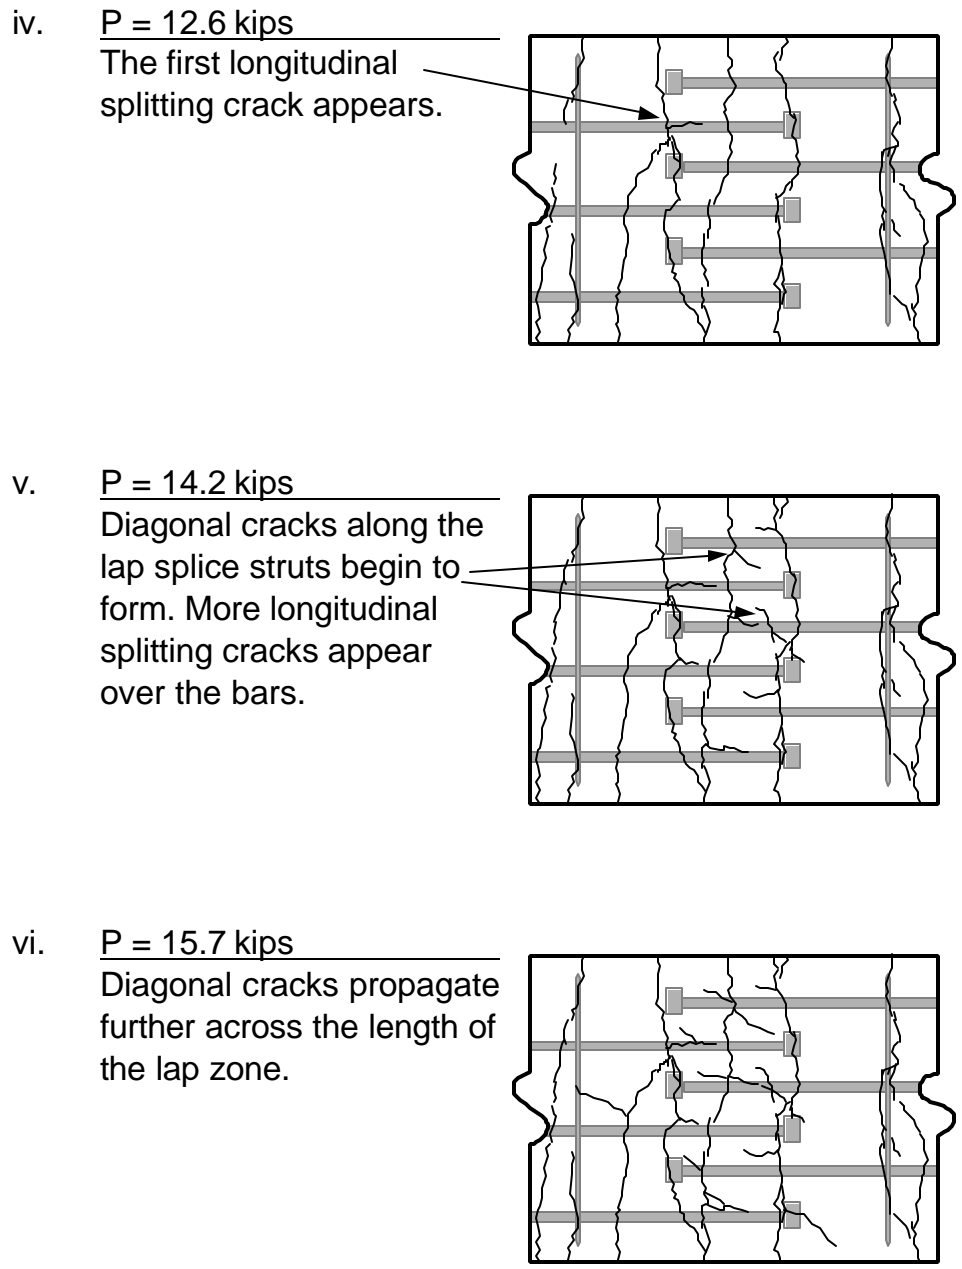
Crack development in a typical unconfined lap splice test (specimen LS-08-04.04-12-10(N)-1) (continued)
